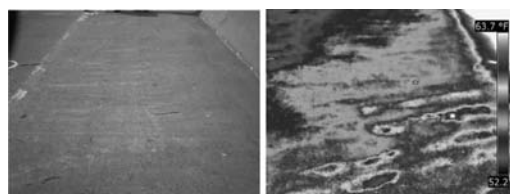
Digital photo with markers and visible spalling (left) and IR image of 3³/₄ hrs after sunrise with clearly visible debonded transversal reinforcement (right).
